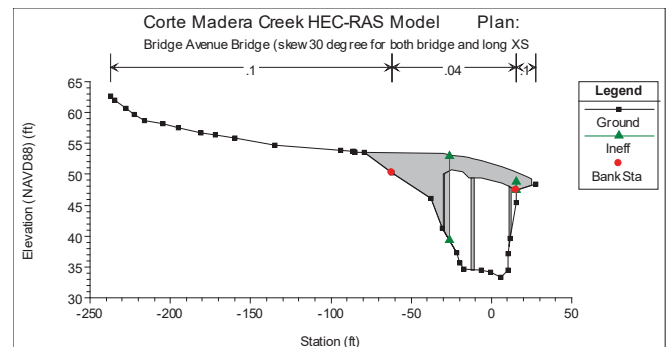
HEC-RAS Cross Section Bridge Boulevard Bridge
